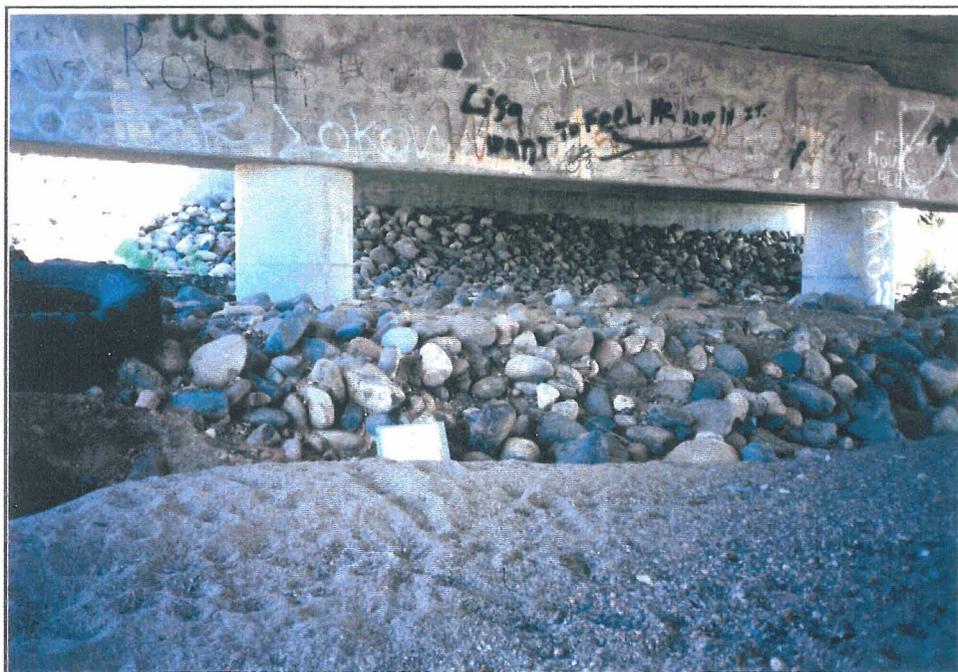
View of east side pier. Note undercutting and destabilization of rip-rap placed along shafts.
